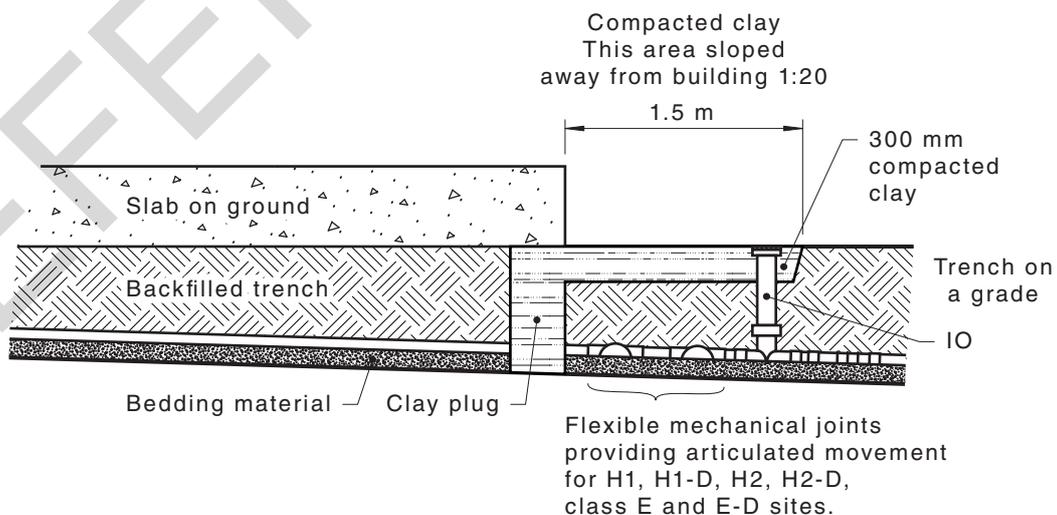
(A) TYPICAL INSTALLATION OF CLAY PLUG
